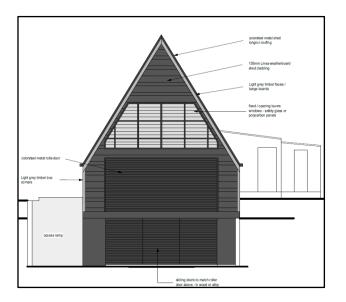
Proposed new eastern building façade (Source: LLA report) – Note: existing slipway level is set approximately at the horizontal dividing beam seen above the lower set of three doors.
